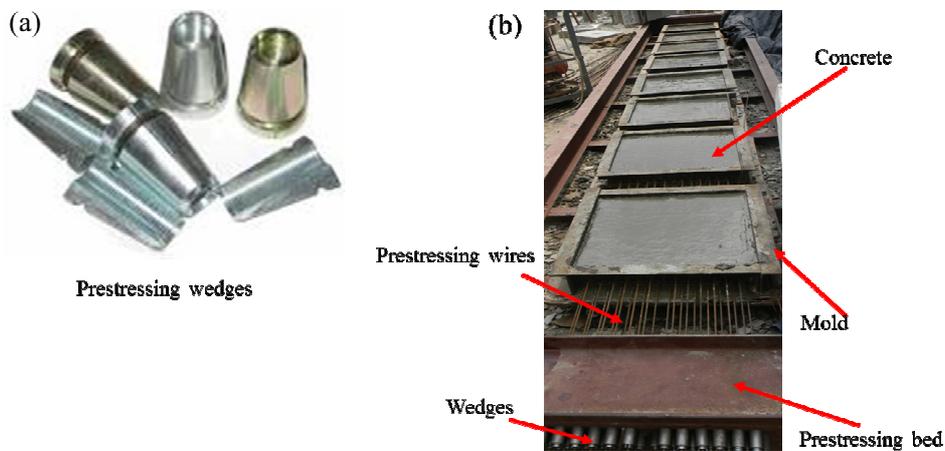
Details of prestressing (a) Steel wedges (b) Casting of Prestressed concrete
